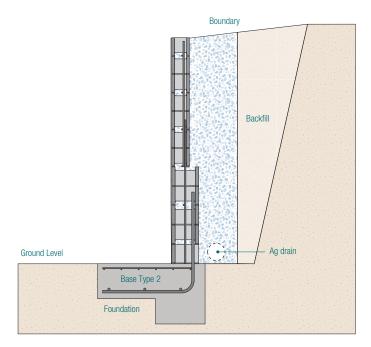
Typical Wall Layout for Base Type 2 (ensure adequate drainage)
